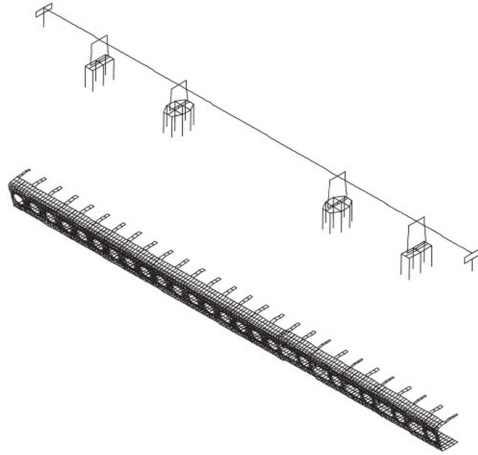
Bridge over the Ebro River. Main piers view. Element model detail.
